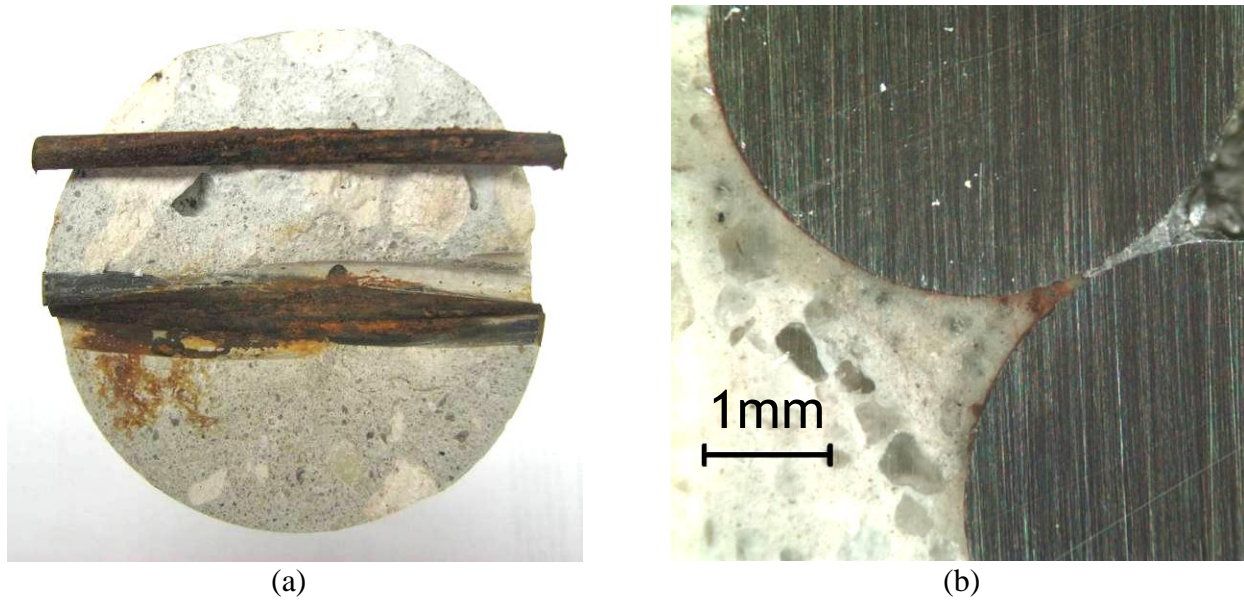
Corrosion of prestressing steel in extracted core
